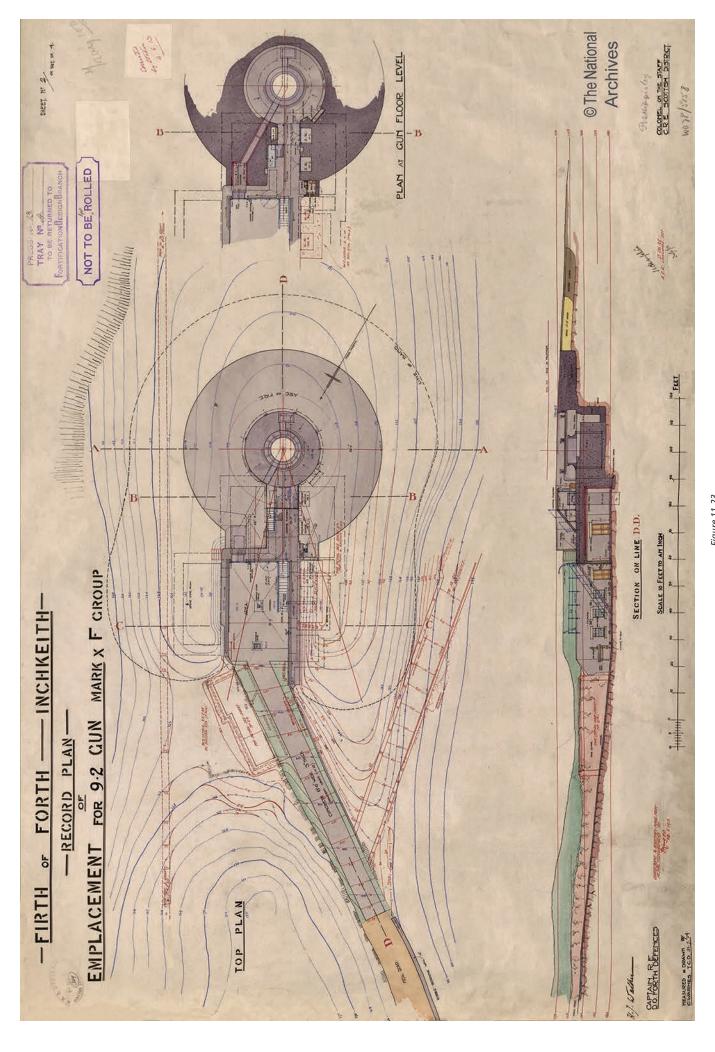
Plan and elevation of the mid-9.2-inch complex, drawn in July 1904, with additional structures planned in 1913. The plan to the right is of the gun floor level (© The National Archives, WO 78/5158)
